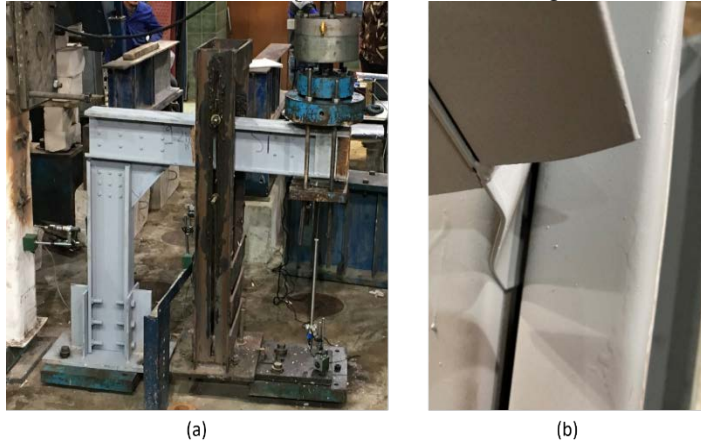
Specimen S1' (a) testing (b) Deformed shape
